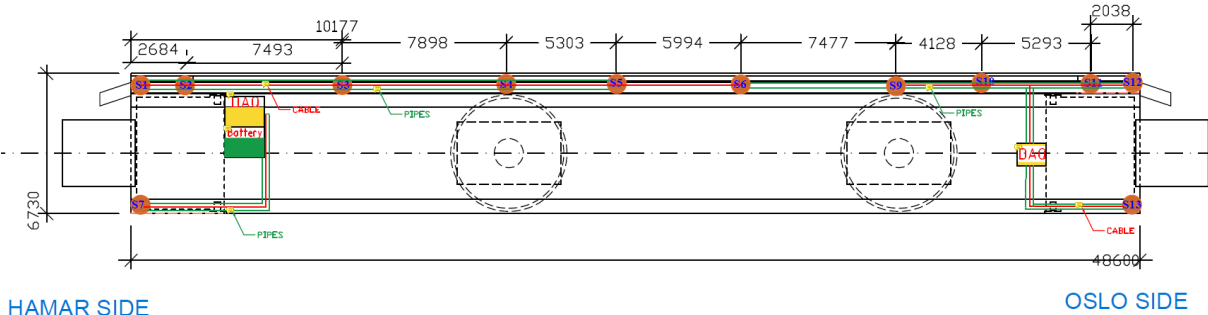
SENSOR LAYOUT FOR THE EASTERN BRIDGE.
